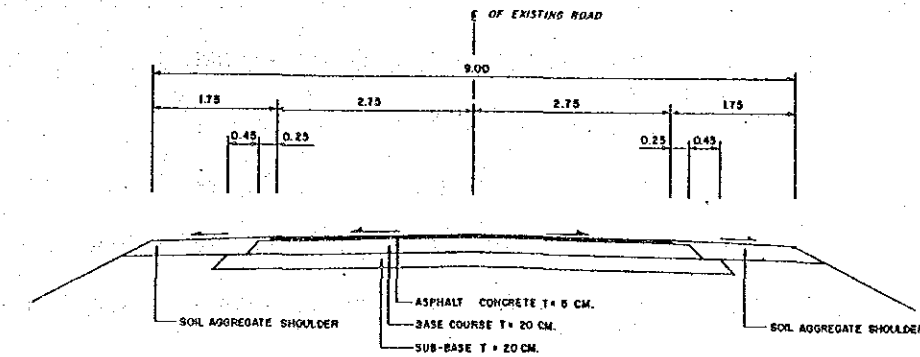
FIGURE TYPICAL PAVEMENT STRUCTURE FOR FLEXIBLE PAVEMENT IM-1
